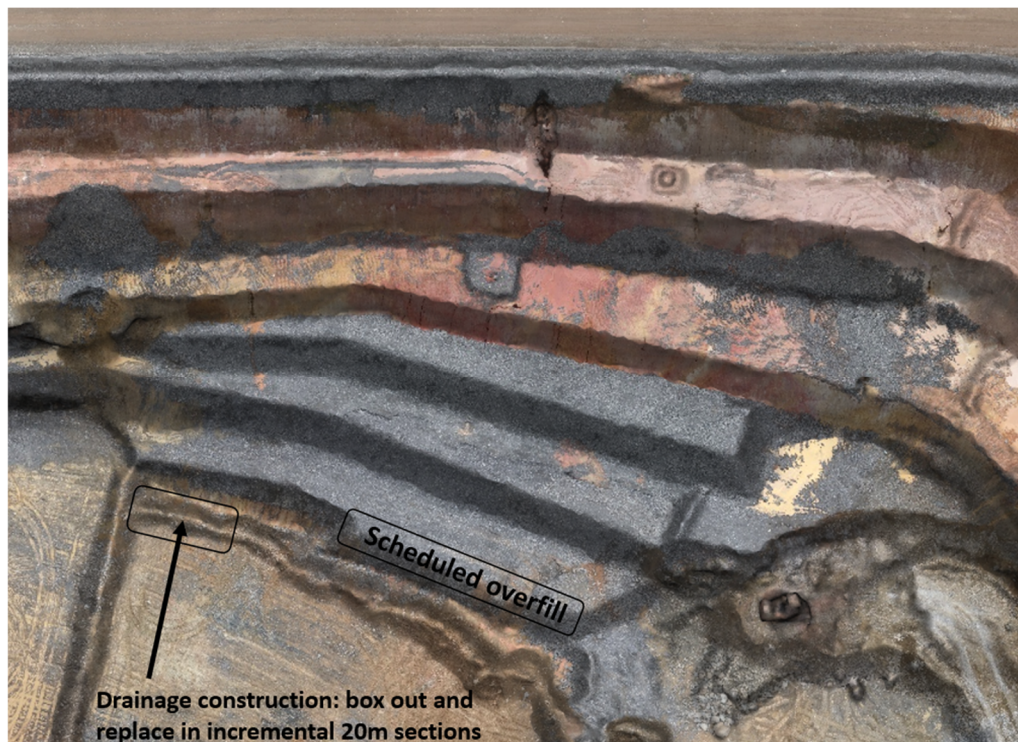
Example of an area to be boxed out and where overfill was placed to promote drainage and stability
